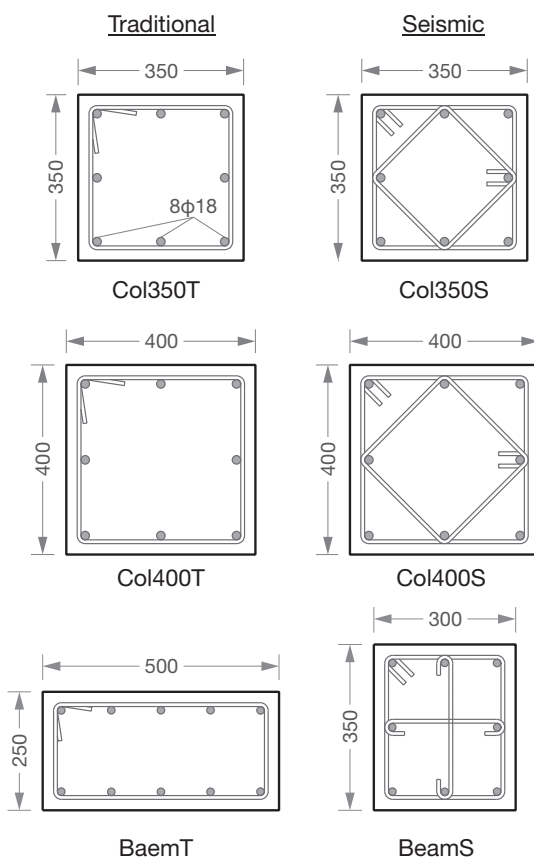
Traditional (left) and seismic designed (right) RC sections of columns and beams used in planar frames models as listed in Table 4.1.
